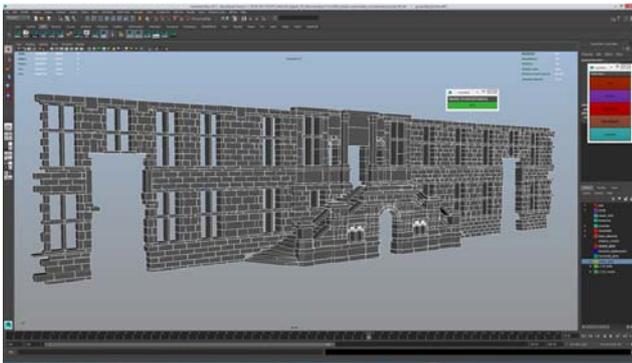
Structural model of facade of Leiden townhall, project WESA (© FG DDU, TU Darmstadt)
